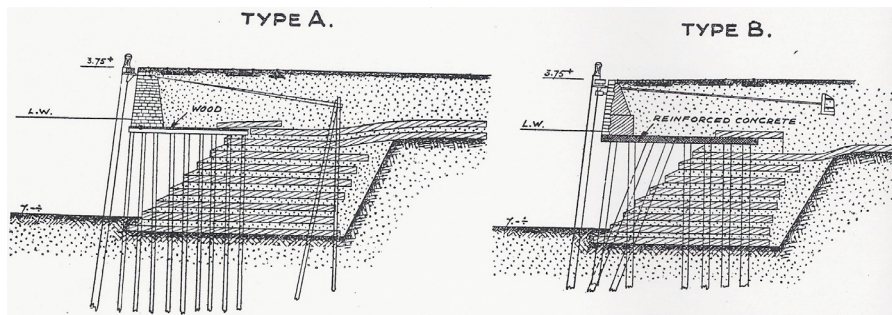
Cross-sections of quay walls in Rotterdam 1930
